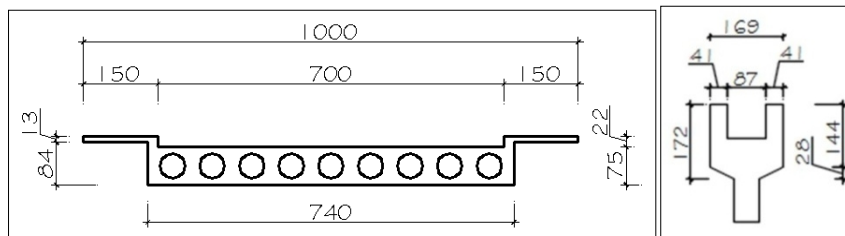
Cross section of the bridge and detail of the pier. Dimensions in centimeters.
